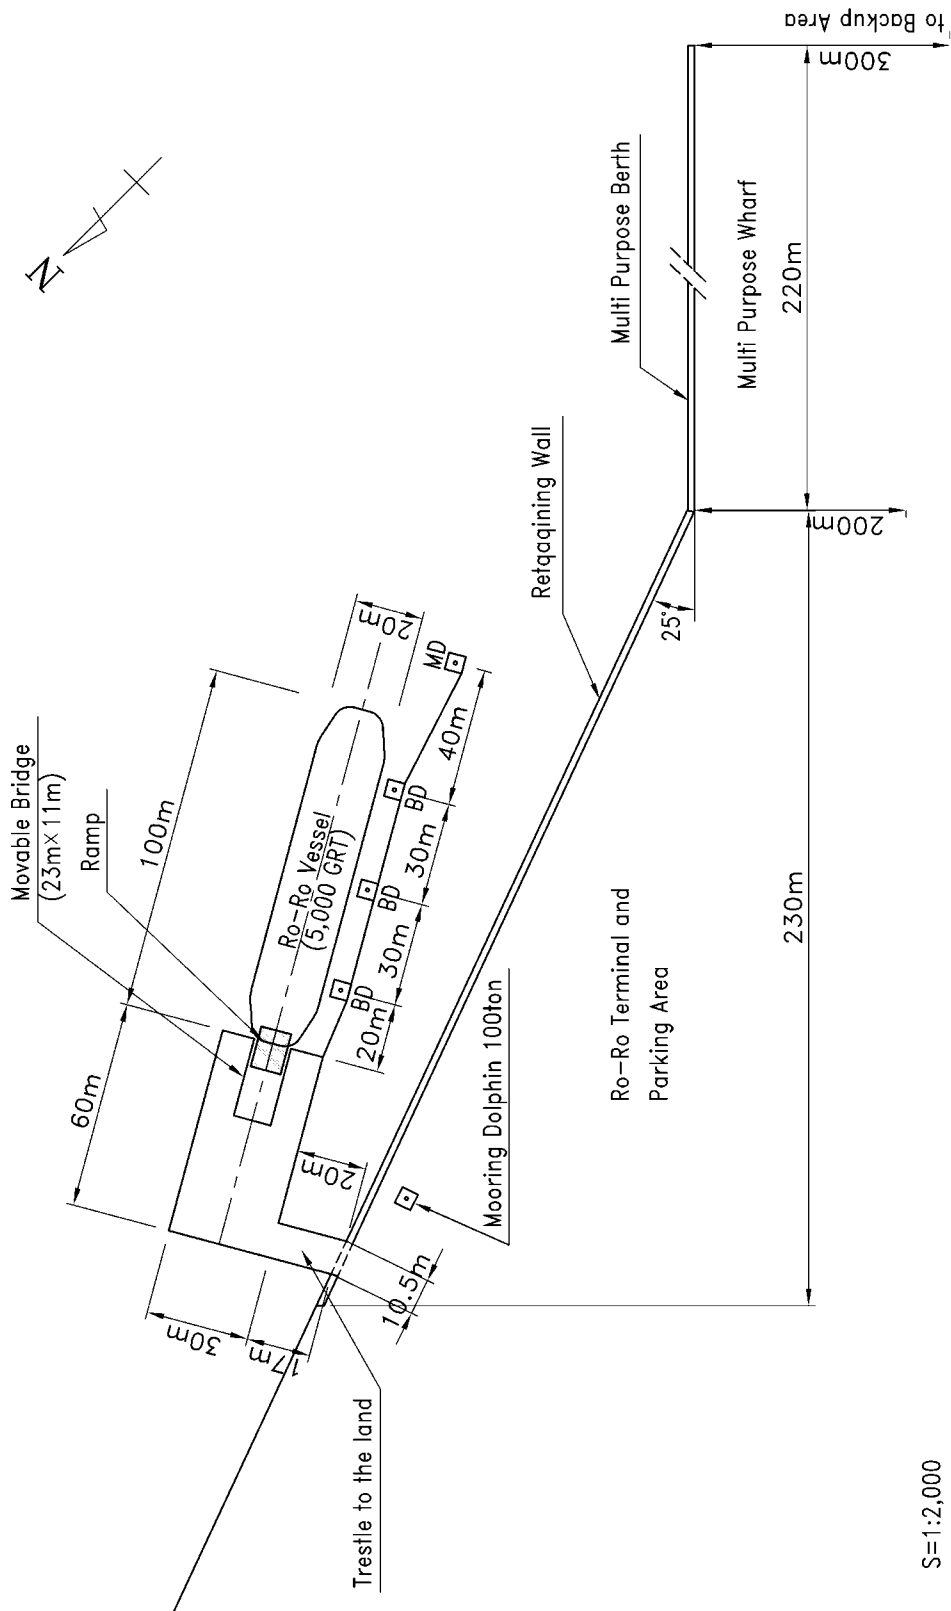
F-15 Typical Plan of Ro-Ro Terminal Berth at Bojonegara Port
